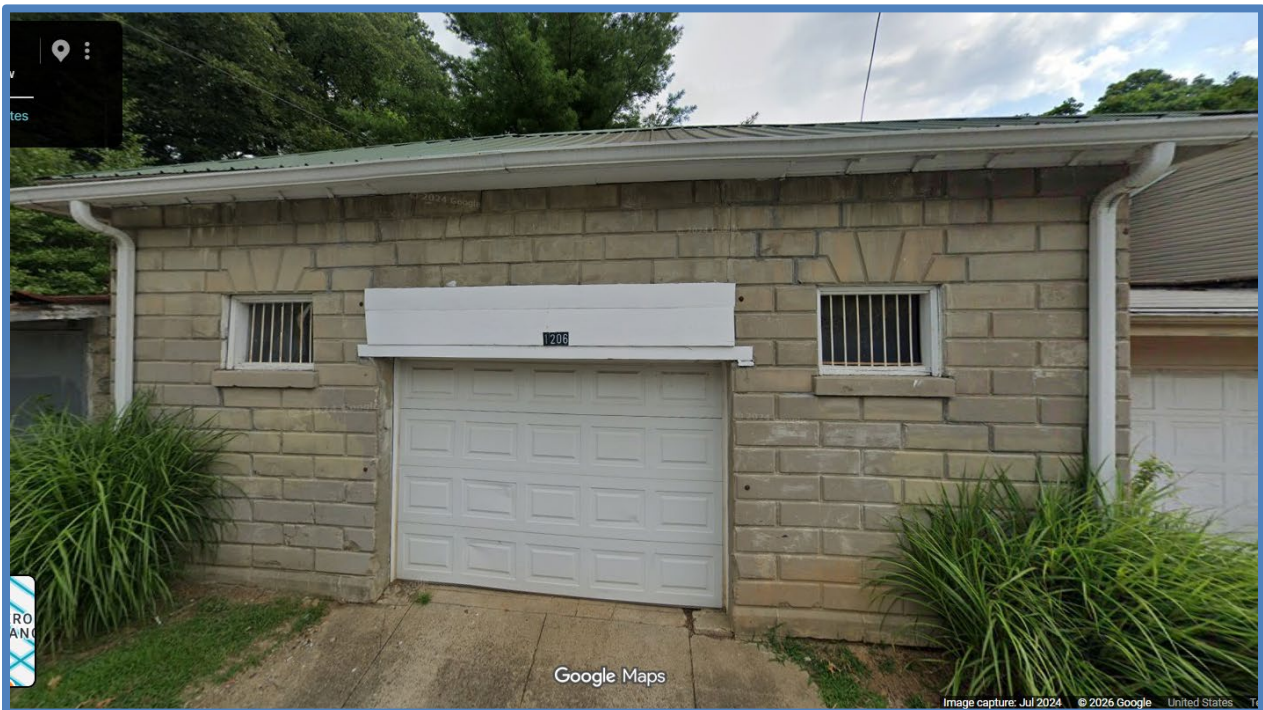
Existing garage proposed for demolition. Source: July 2024 Google Street View
